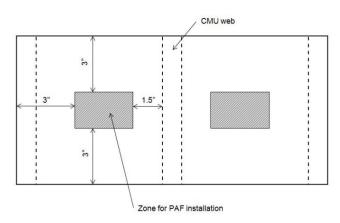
ZONE FOR FASTENER INSTALLATION IN FACE SHELL OF CMU
